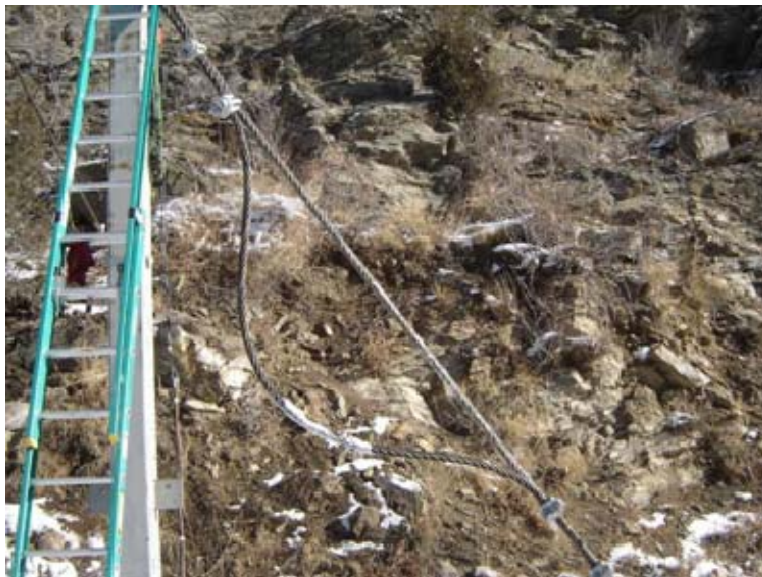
Field-designed friction-brake assembly installed on main support cable.
